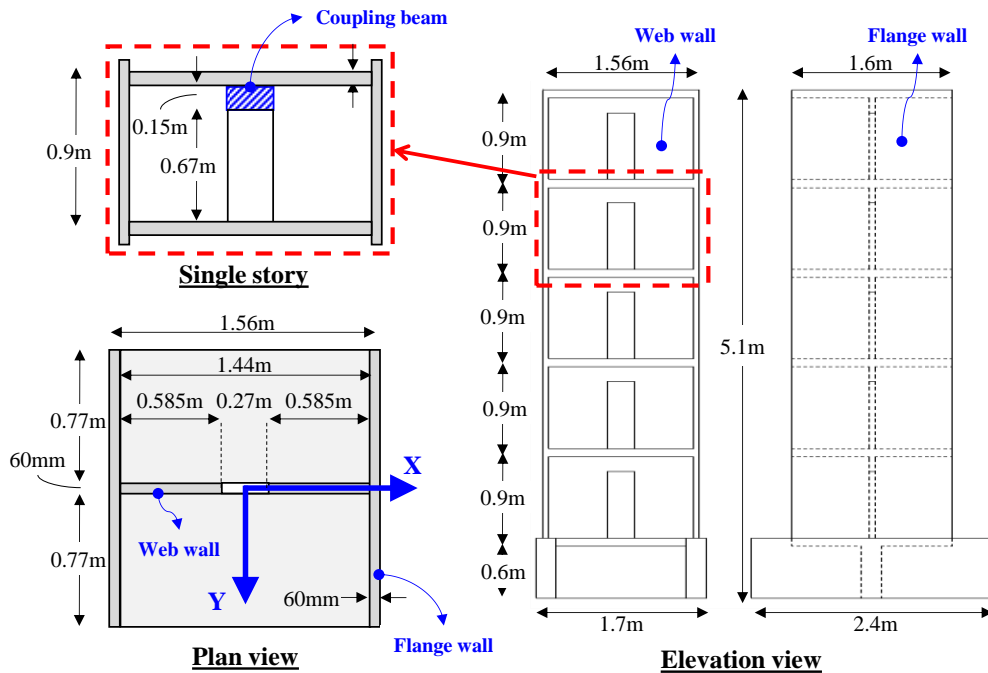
Geometry of the H-shaped wall specimen tested by Kante (2005)
